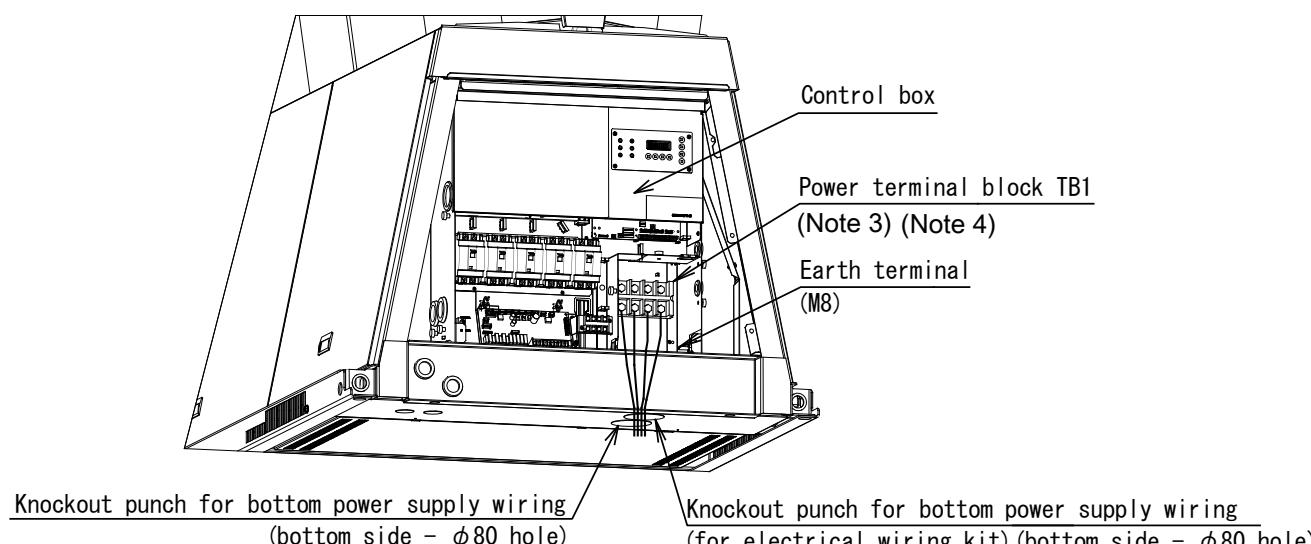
Figure B - Power supply wiring example (utilise the bottom power supply wiring hole)
